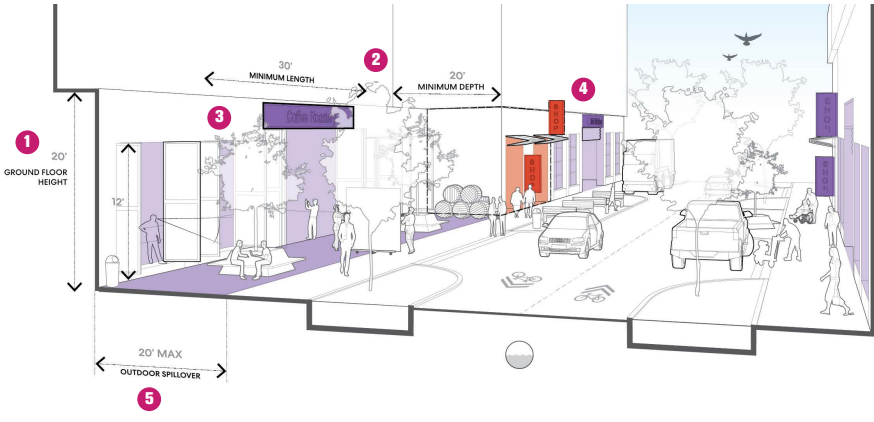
Ground Floor Industrial, Artisan, Manufacturing Section
